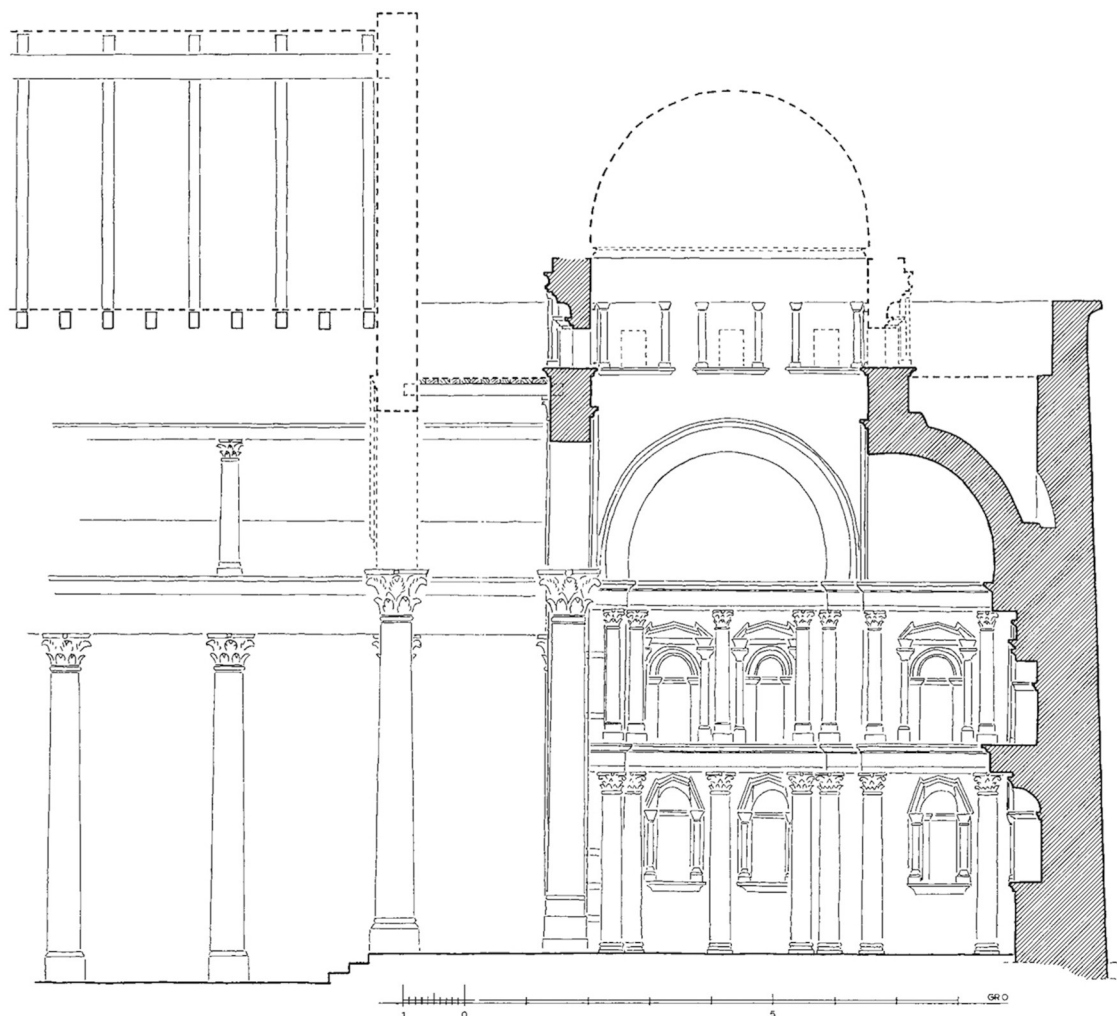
East-west reconstructed section of Red Monastery church looking north showing east gable above large columns (drawing: Peter Grossmann, 2006)
